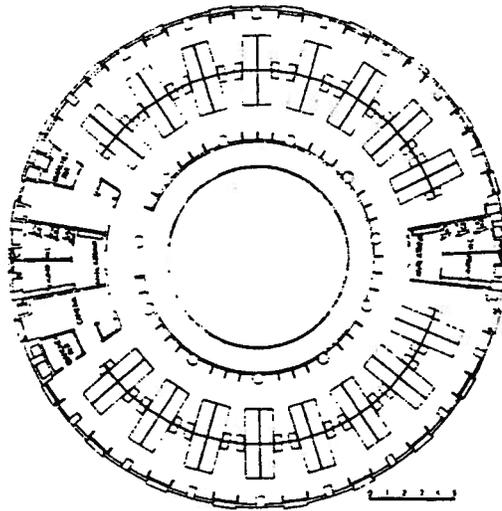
Fiat Colonia Torre Balilla, plan and arrangement of beds on the tower ramp.
